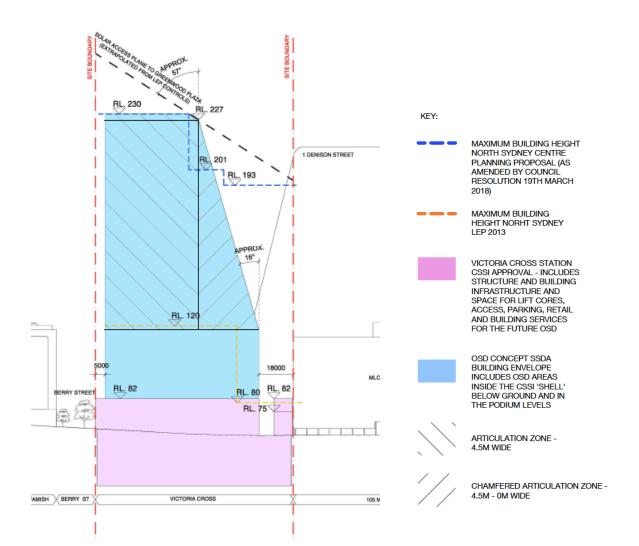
Amended proposed building envelope: east-west section Source: Sydney Metro
